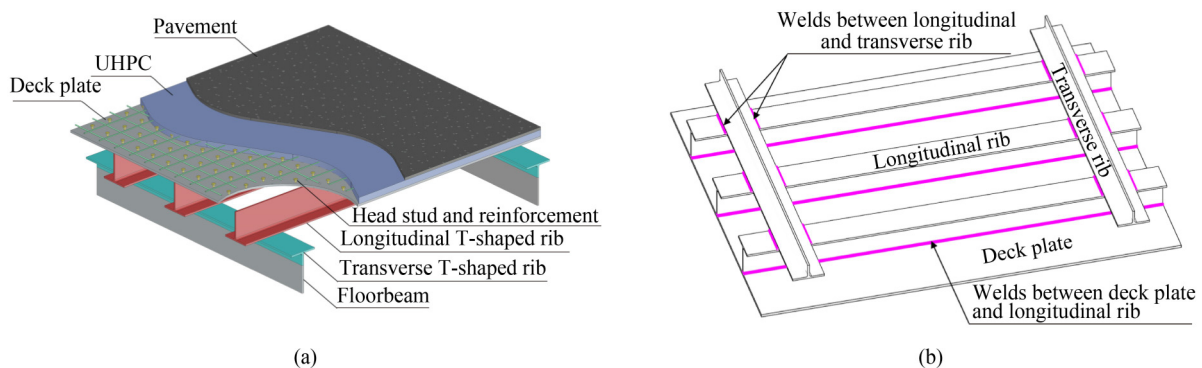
Schematic drawings of the SSD and welds connection: (a) schematic drawing of the SSD; (b) deck unit and welds connection.
